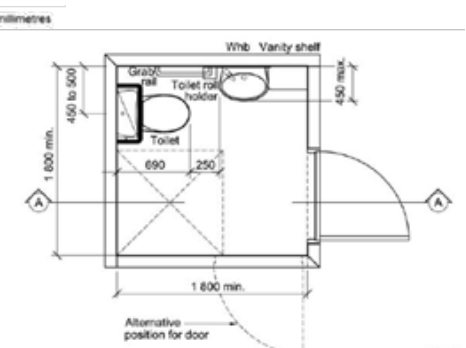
Disabled facilities - plan (SANS 2006; Part S)
